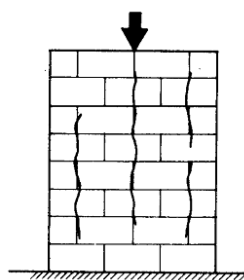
Splitting of wall in tension under action of vertical compressive load
